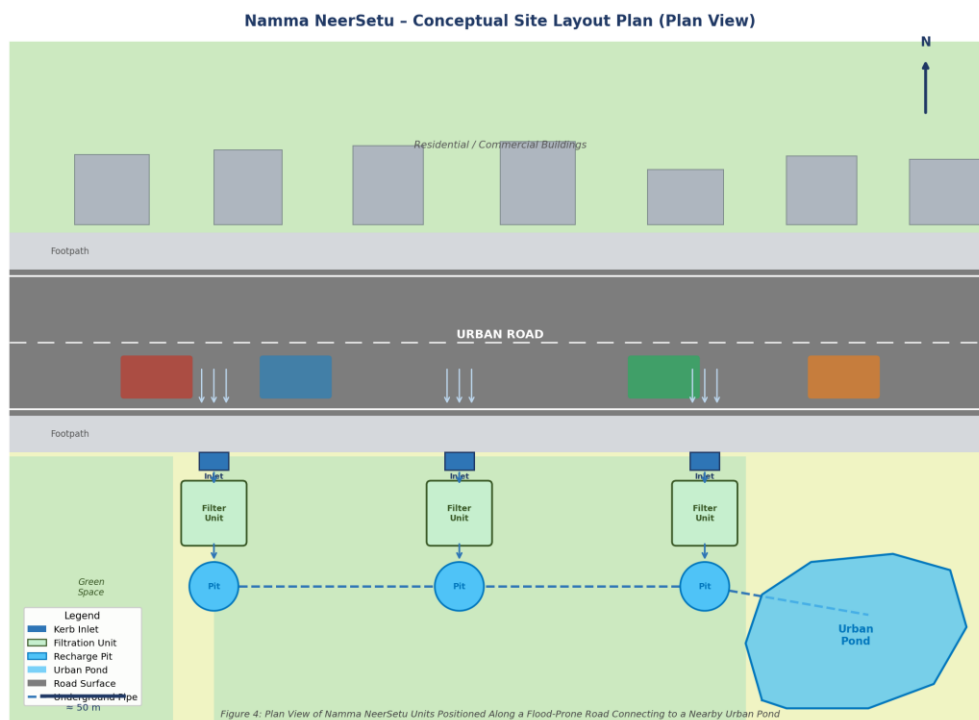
Plan View of Namma NeerSetu Units Positioned Along a Flood-Prone Road Connecting to a Nearby
